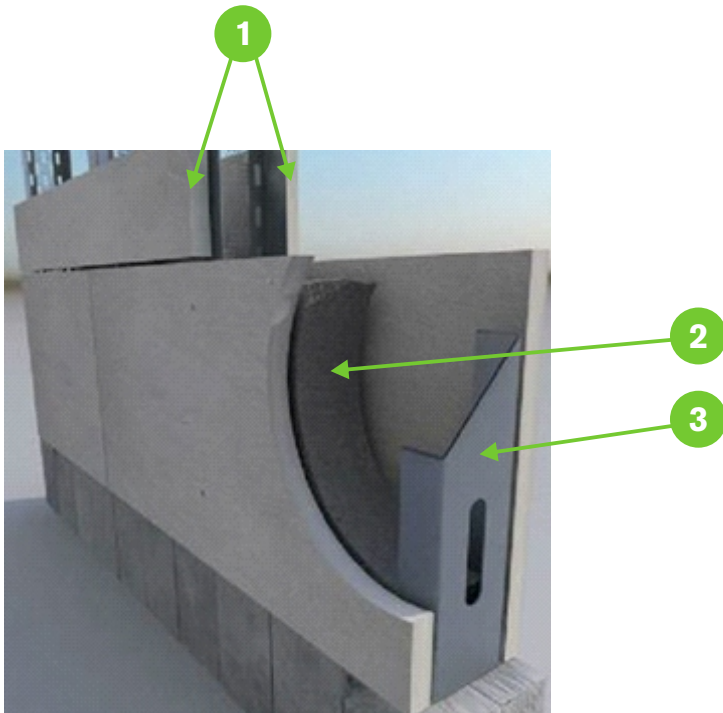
Section view of the construction built with light steel frame and ECOLIT Lightweight concrete.
